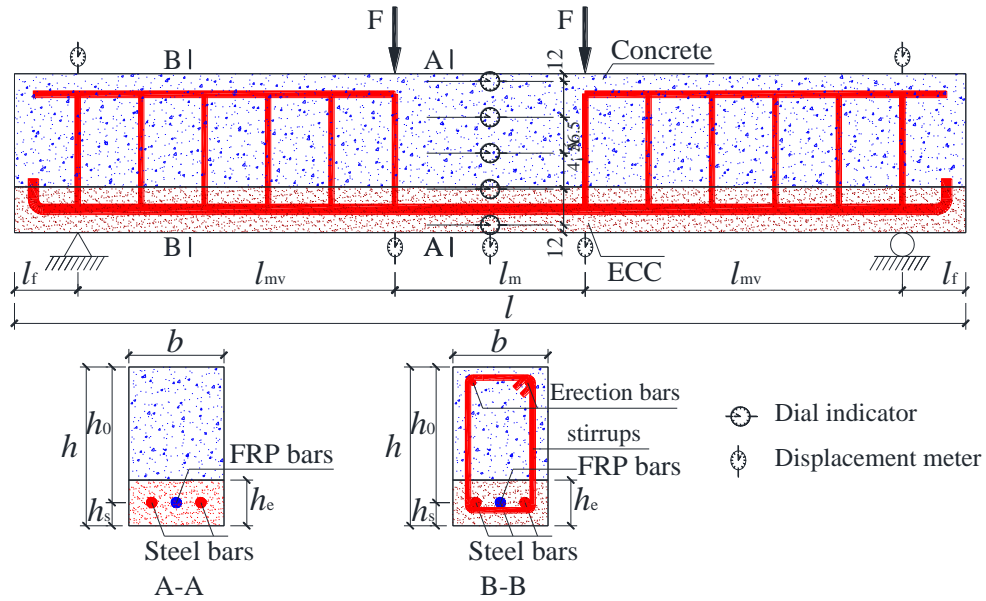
Schematic diagram of hybrid reinforced ECC-concrete composite beams
